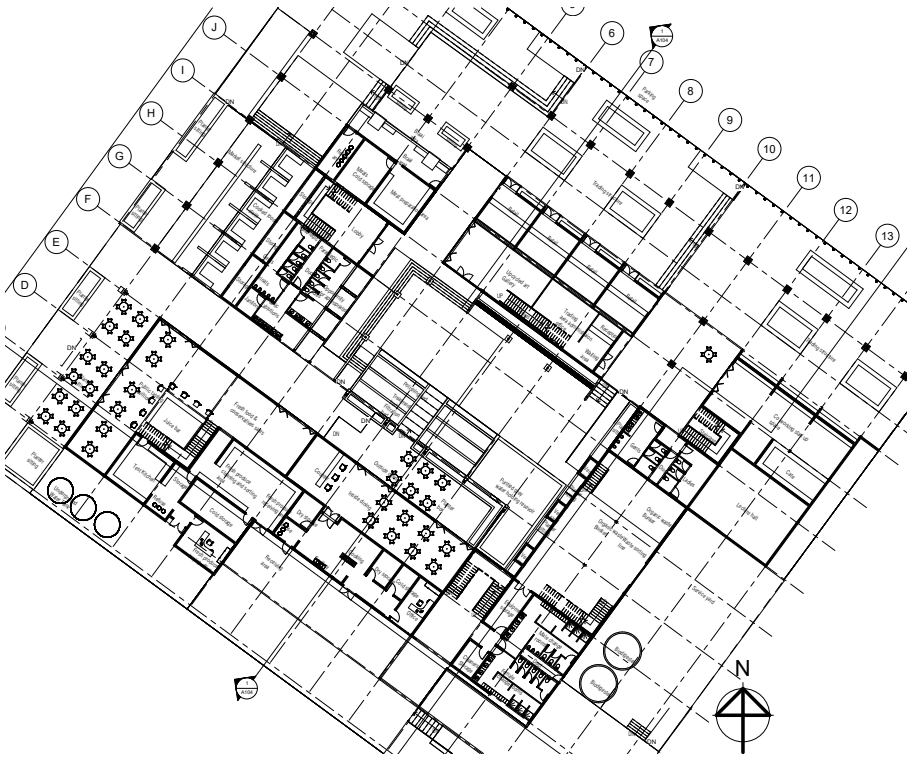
Iteration 7 Ground floor plan (Author,2020)
